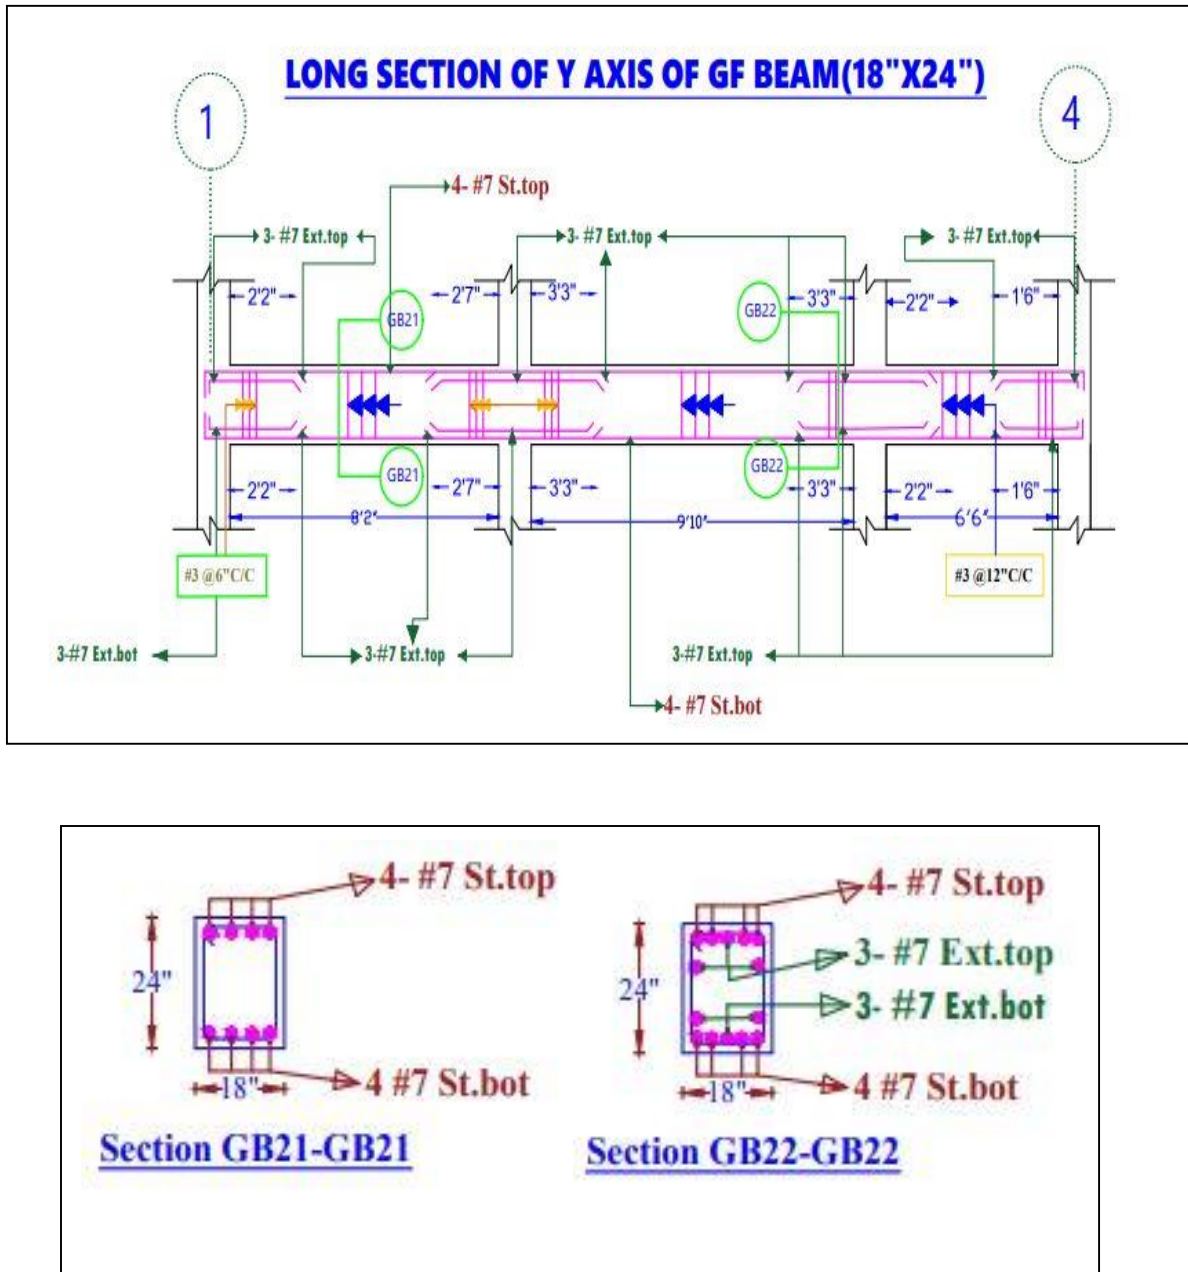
Beam Detailing & Cross Section of Y-axis
